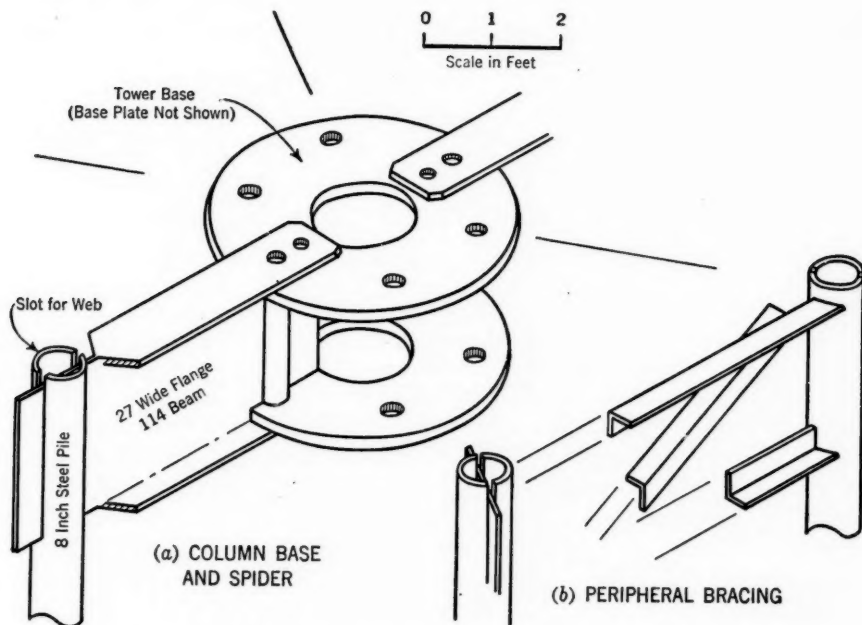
STEEL ASSEMBLY FOR TOWER FOUNDATION
